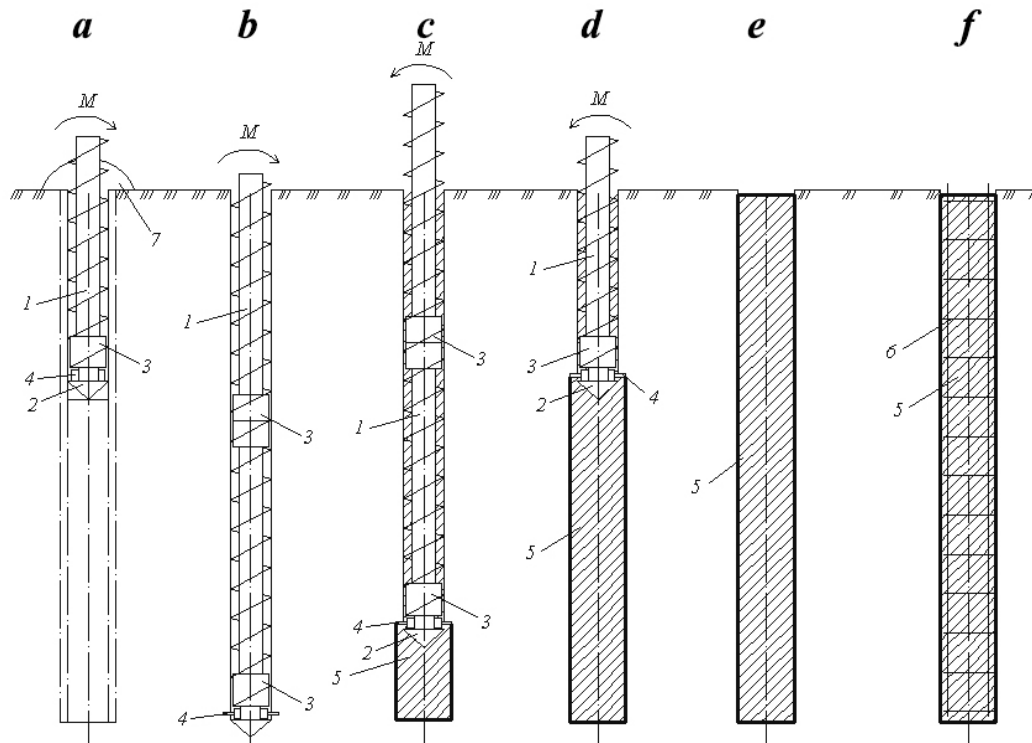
Technological scheme of arrangement of soil-cement element with partial excavation of soil:
